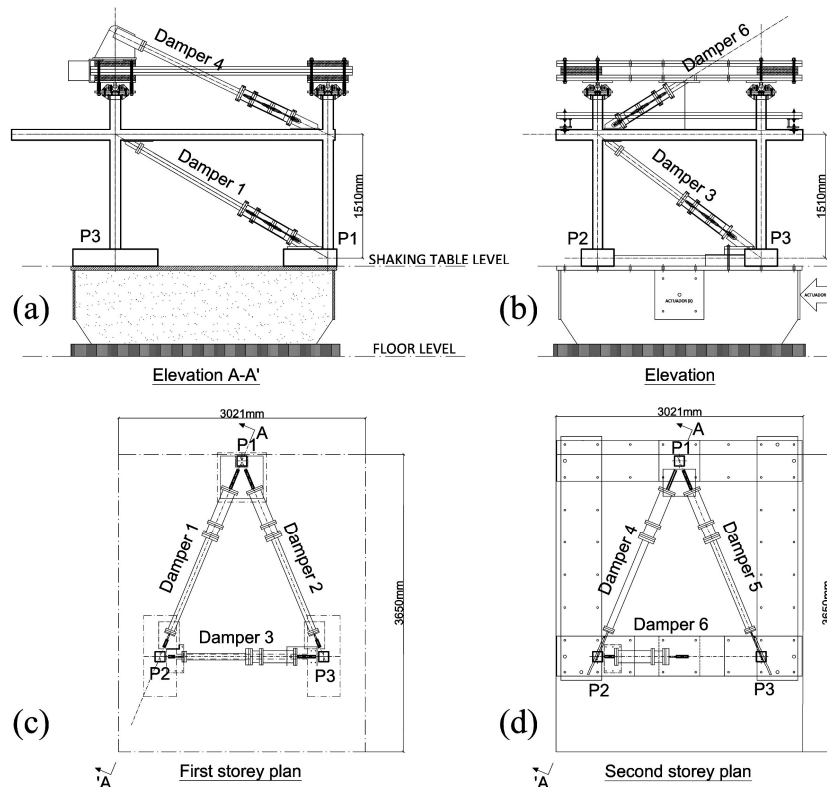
Details of the experimental set up for the shake table tests: (a) elevation view A-A', (b) elevation, (c) plan (first storey), (d) plan (second storey).
